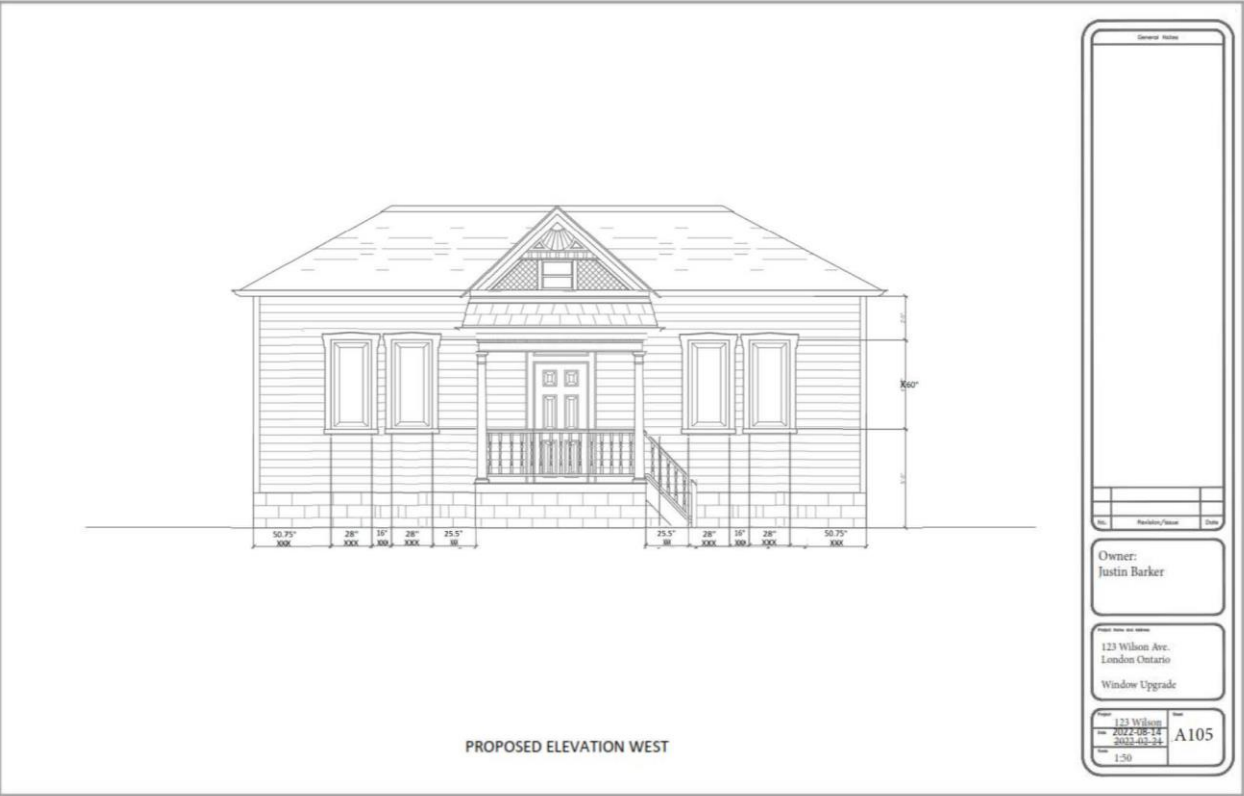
Proposed west elevation drawing, submitted as part of the Heritage Alteration Permit application. Showing the reinstated five-bay design with replicated window trim. Note: the proposed replacement windows must include the two-over-two fenestration pattern of the former windows (not shown on the above drawing).
